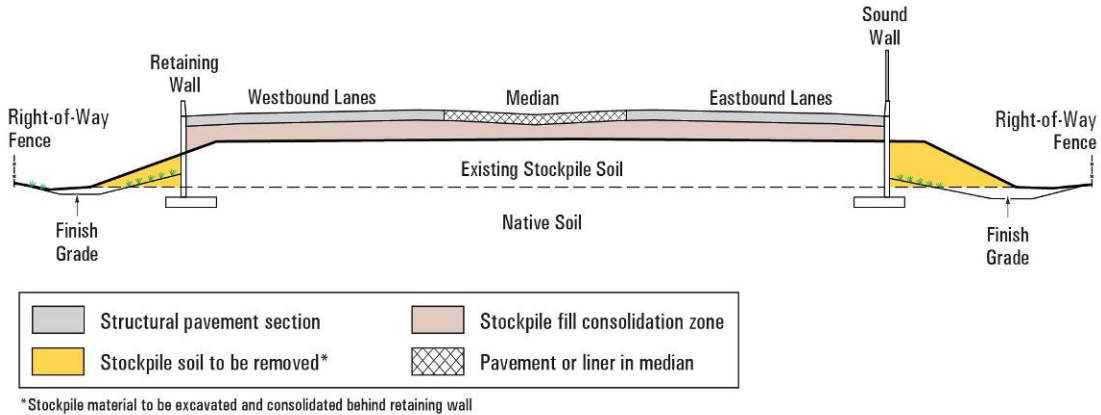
Phase 2 - Typical Stockpile Cross-Section
